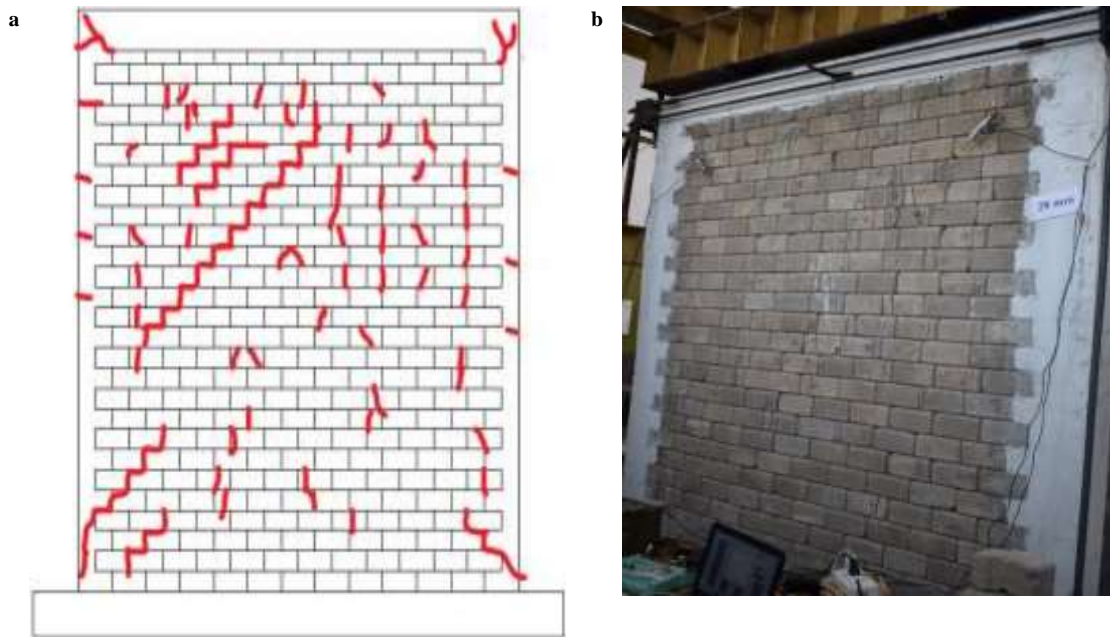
(a) Damages and Crack Development in the DSBM Wall (b) Real Time Picture showing crack pattern
